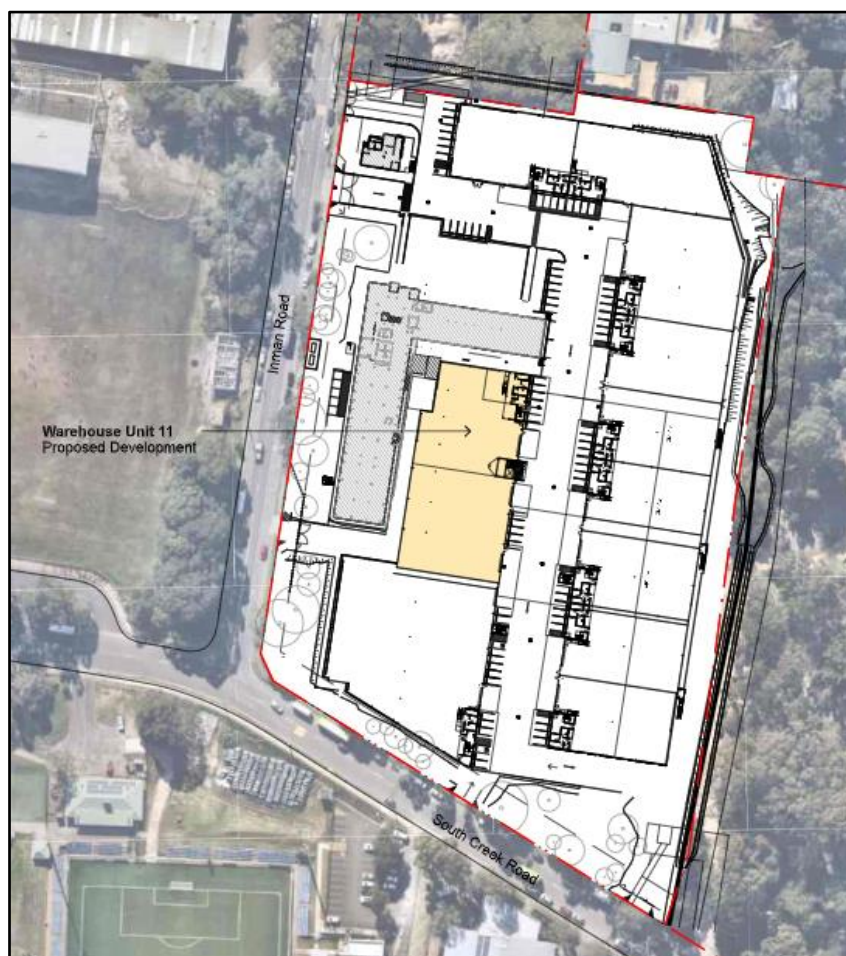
Excerpt from Proposed Site Plan, showing the location of Unit 11 within the proposed development.
